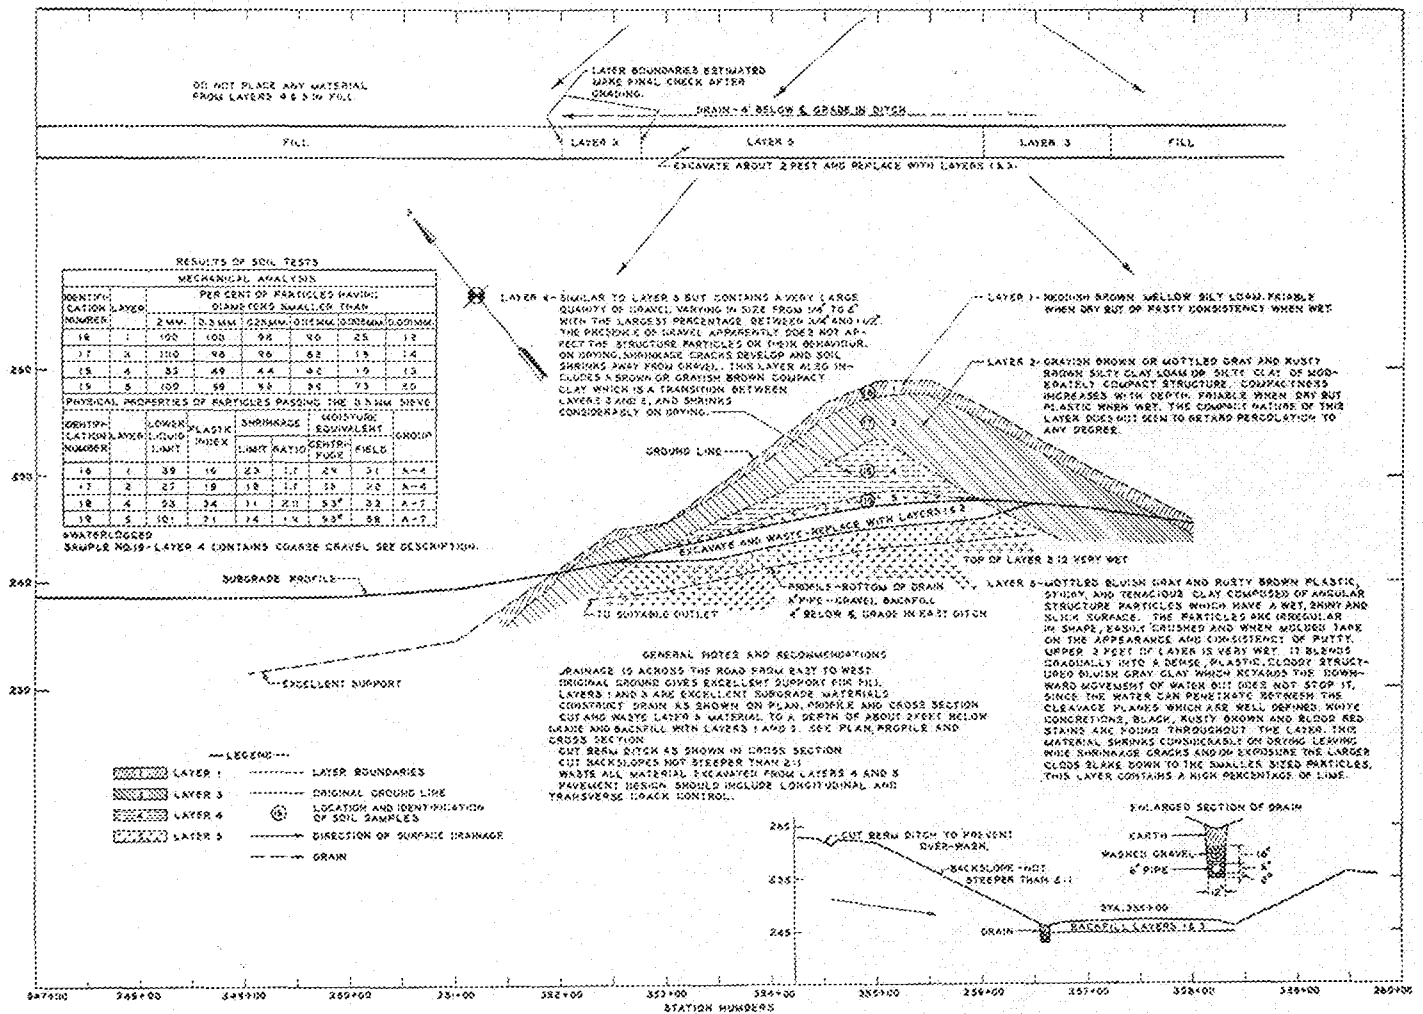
SUBGRADE SURVEY SHEET FOR THE DESIGN OF NEW ROAD
